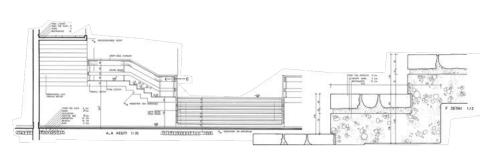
The elevation showing the façade details of the steps and the 1/2 detail drawings.
